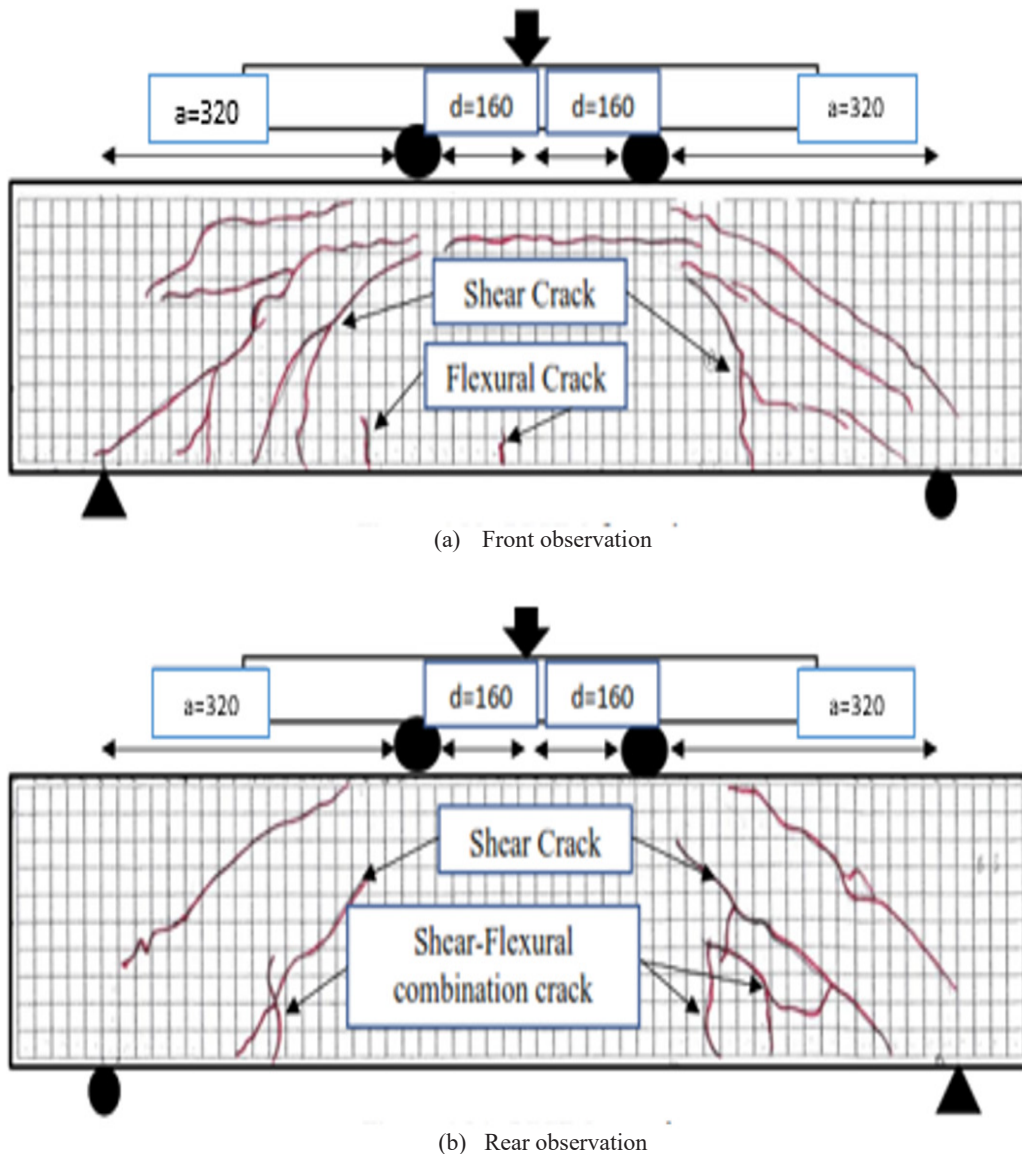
Characteristics of cracks on SCC beams under flexural test ($a=320$ mm)
